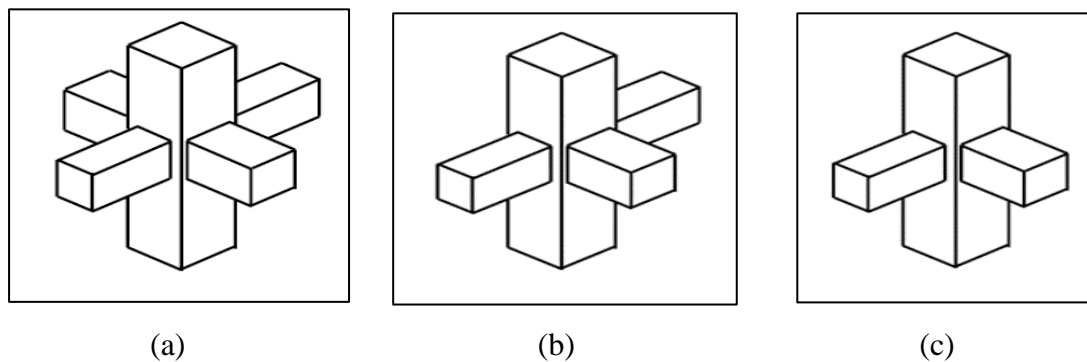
Types of joints in a frame: (a) Interior joint, (b) Exterior joint and (c) Corner joint (Source: Uma and Prasad, 2015)
